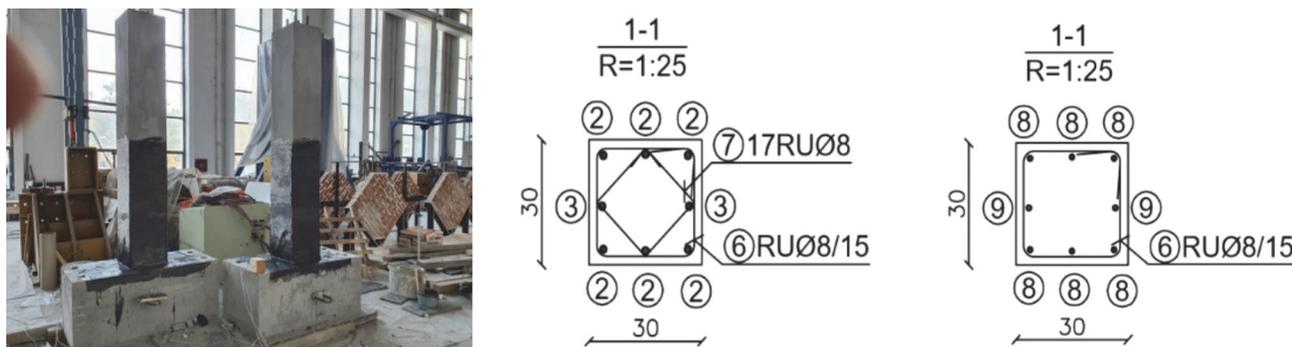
Design of column models and cross section (Model M1 - left, Model M2 - right)
